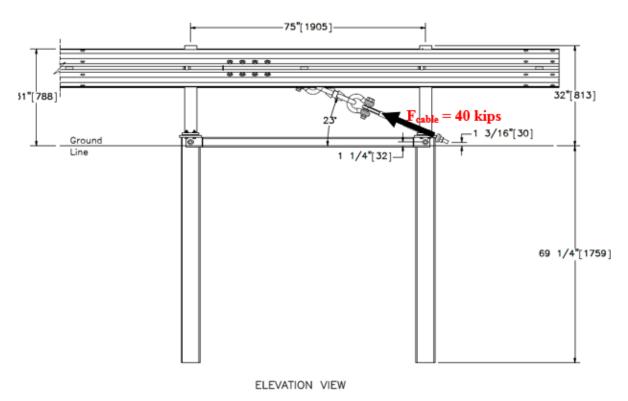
Downstream Anchorage Modified Design Concept No. 3
